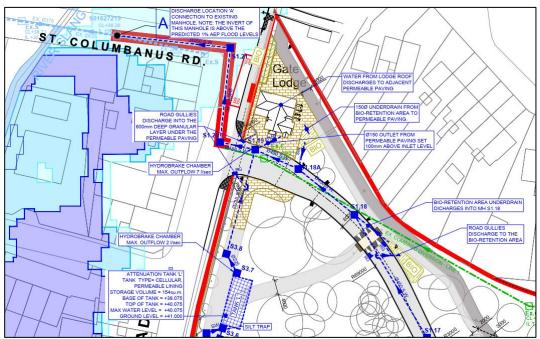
SW Connection Point to Existing Manhole Next to the River Slang
